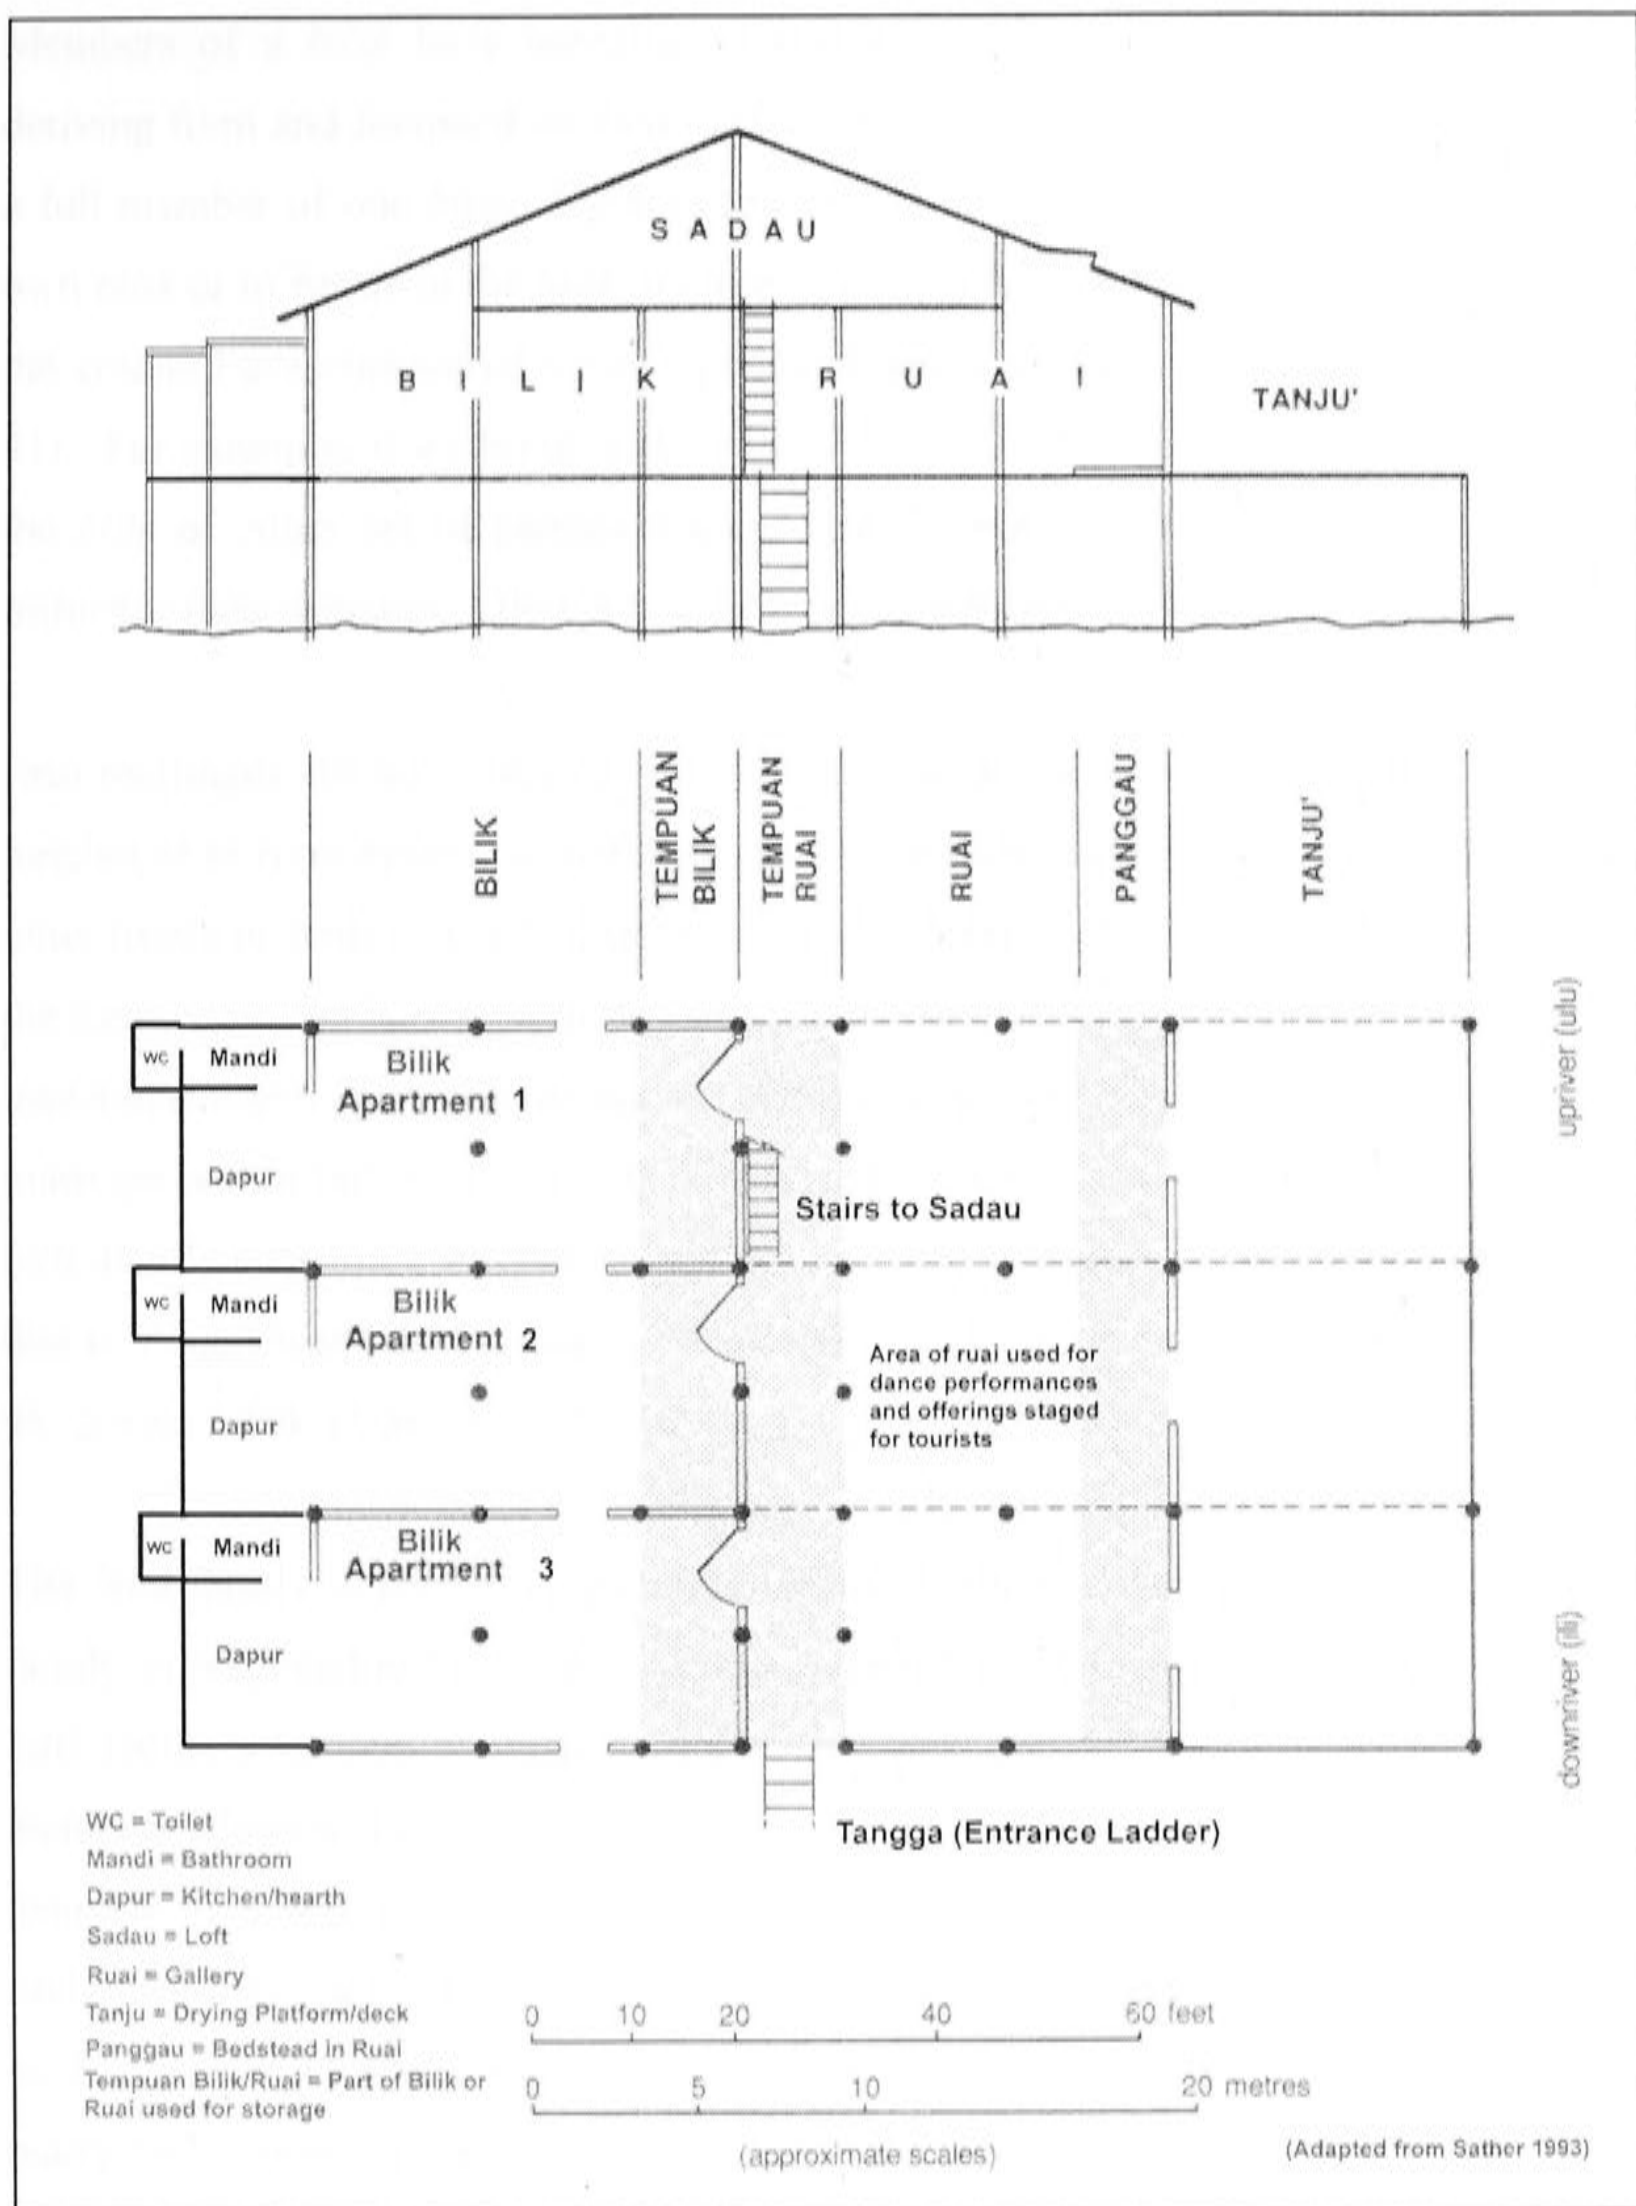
Section and plan adapted from Sather (1993a) to show the design of a typical 'older-style' wooden longhouse.
